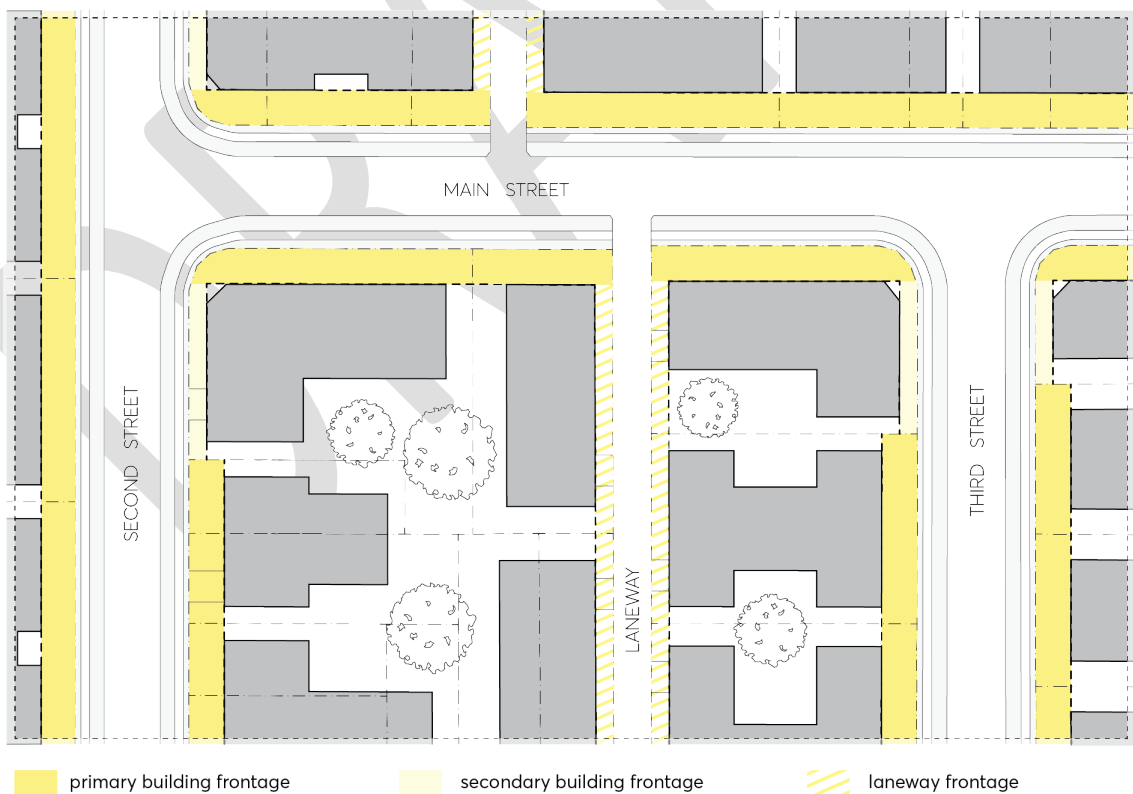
Determining primary and secondary street frontages on amalgamated lots
